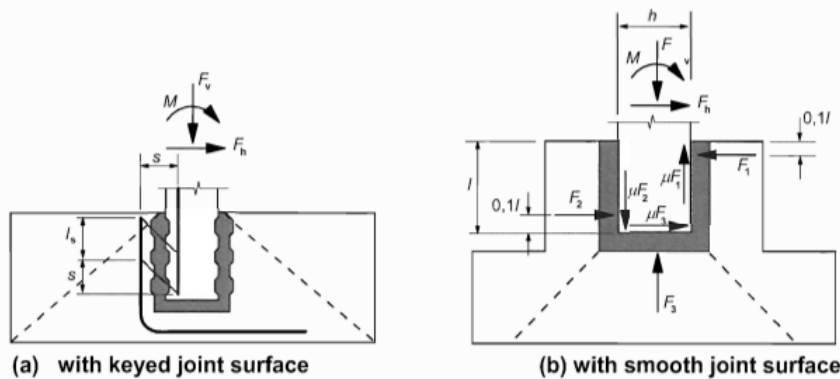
Pocket foundation: (a) with keyed joint surface (b) with smooth joint surface (3)
